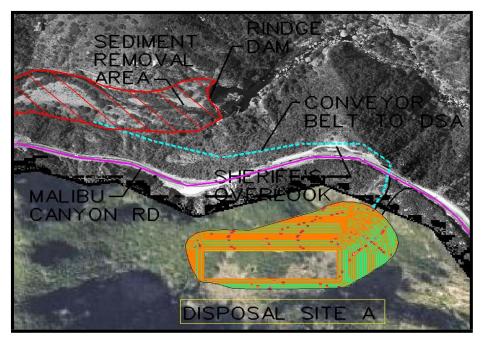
Conveyor Belt Alignment to Disposal Site A
